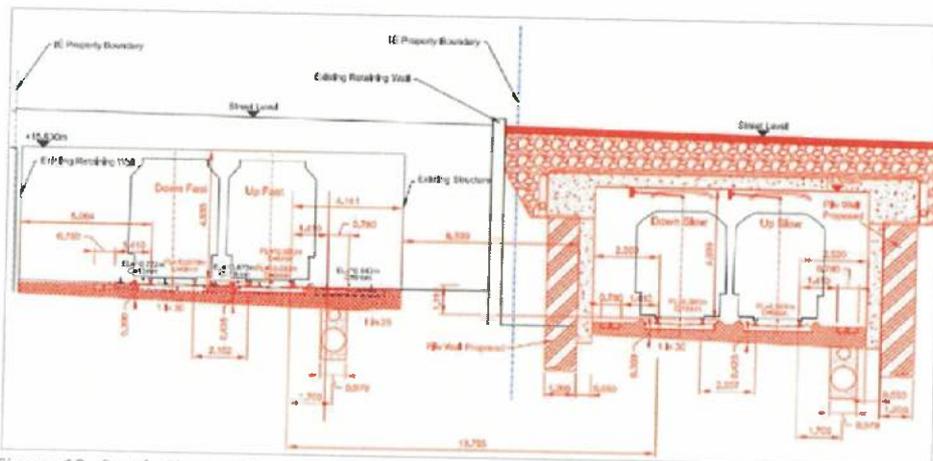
South Circular Road Bridge (OBC1) and New Cut and Cover Structure (OBC1A) – Cross section at CH 9+401, View Facing West (extracted from Chapter 5 of the EIAR, page. 109)
